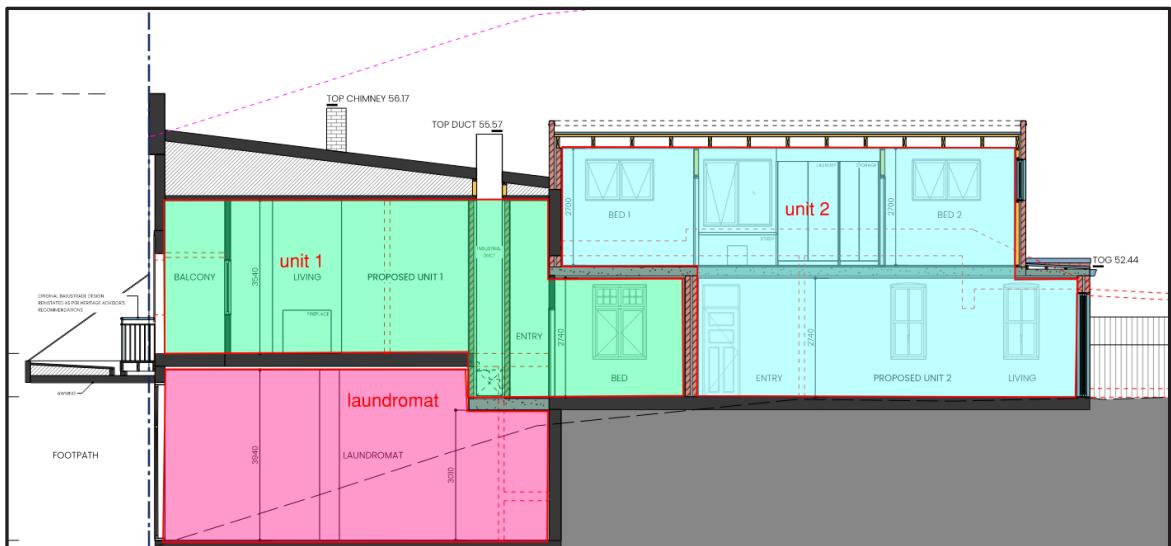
Proposed section plan showing laundromat (pink shaded), unit 1 (green shaded) and unit 2 (blue shaded).
